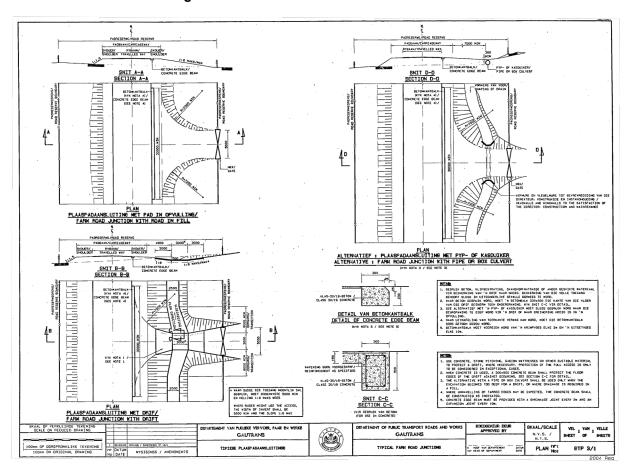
Typical Gautrans Intersection and Farm Access Detail
